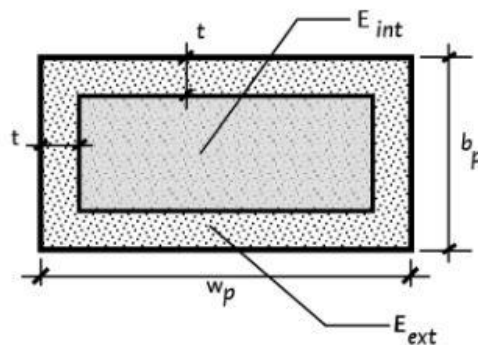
typical mixed pier section (Espejo, S. R. 2007).
